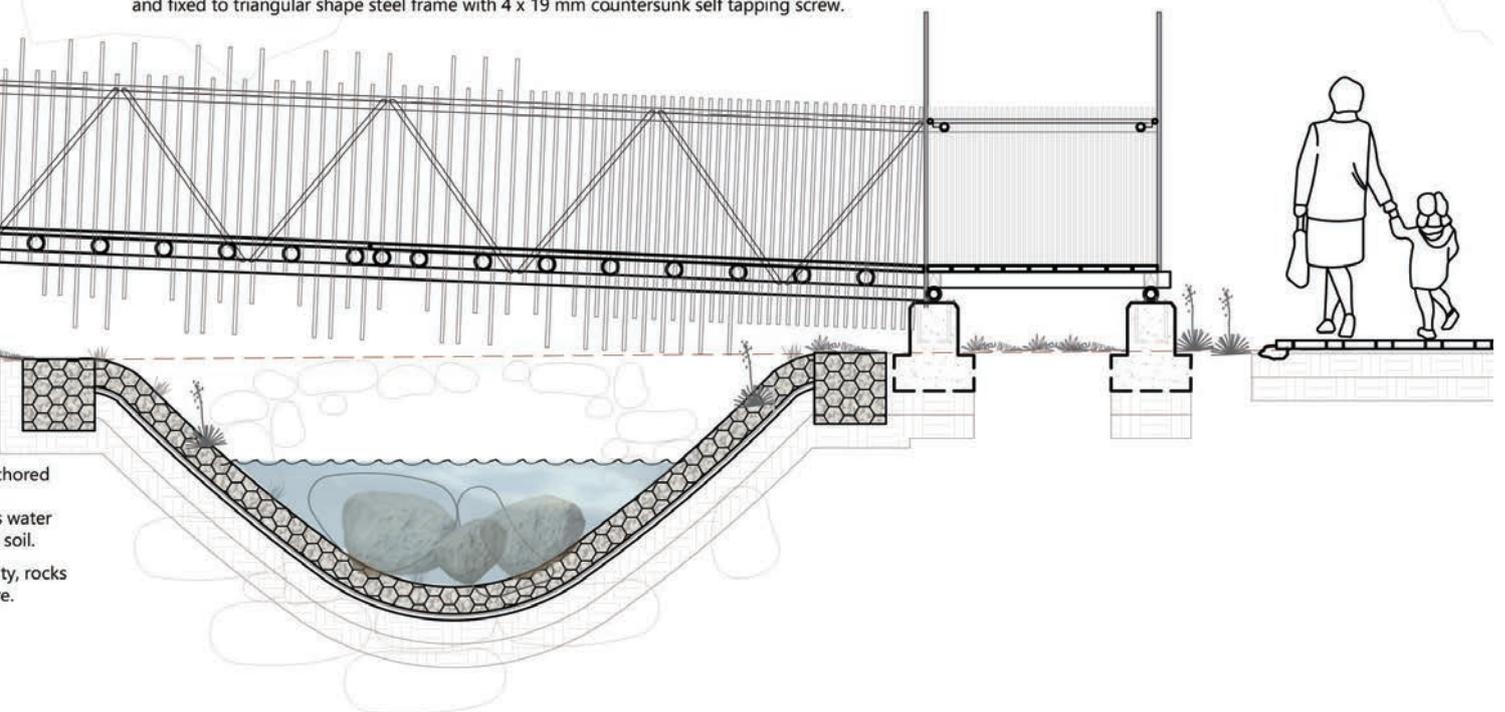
Detail where bridge components are fixed to concrete footing, scale 1:20 (Author, 2017)
